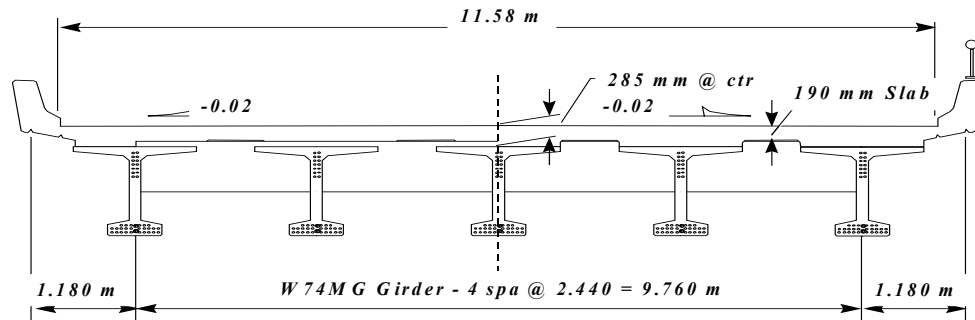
Bridge Cross-Section at Pier 2 (looking north)
